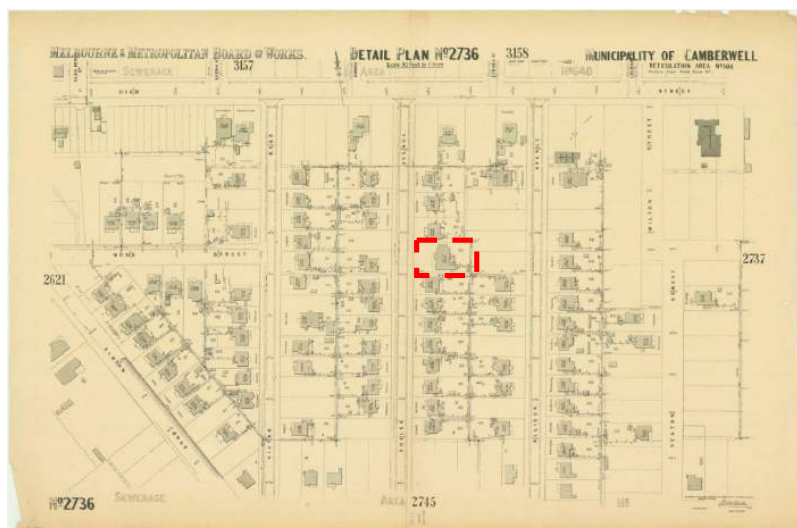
MMBW Detail Plan 2736, Municipality of Camberwell, 1927 (Source) SLV).
